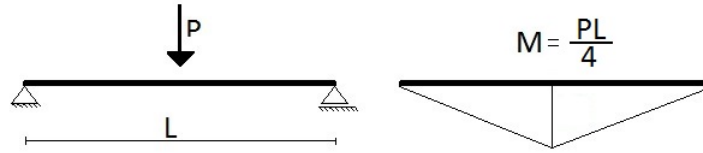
Simply supported beam subjected to a vertical load  $P$  at the center.
